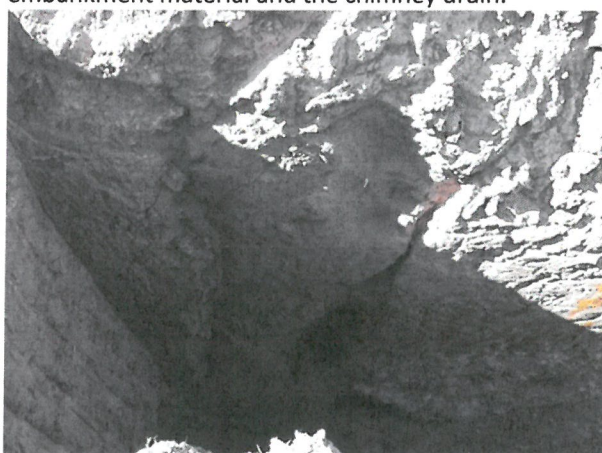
A5-3 – T-14 location: Looking northeast down into trench at the northeast wall. The chimney drain can be seen in the middle of the photo.
